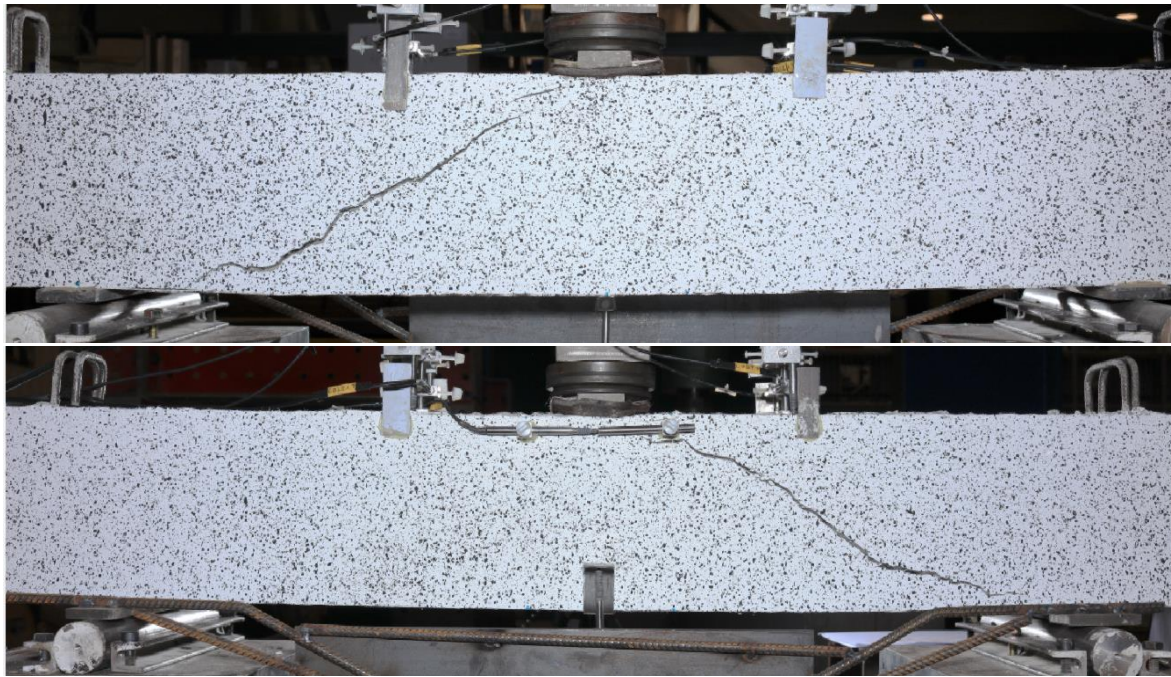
The final crack pattern of the hybrid beam B1 with shear reinforcement
